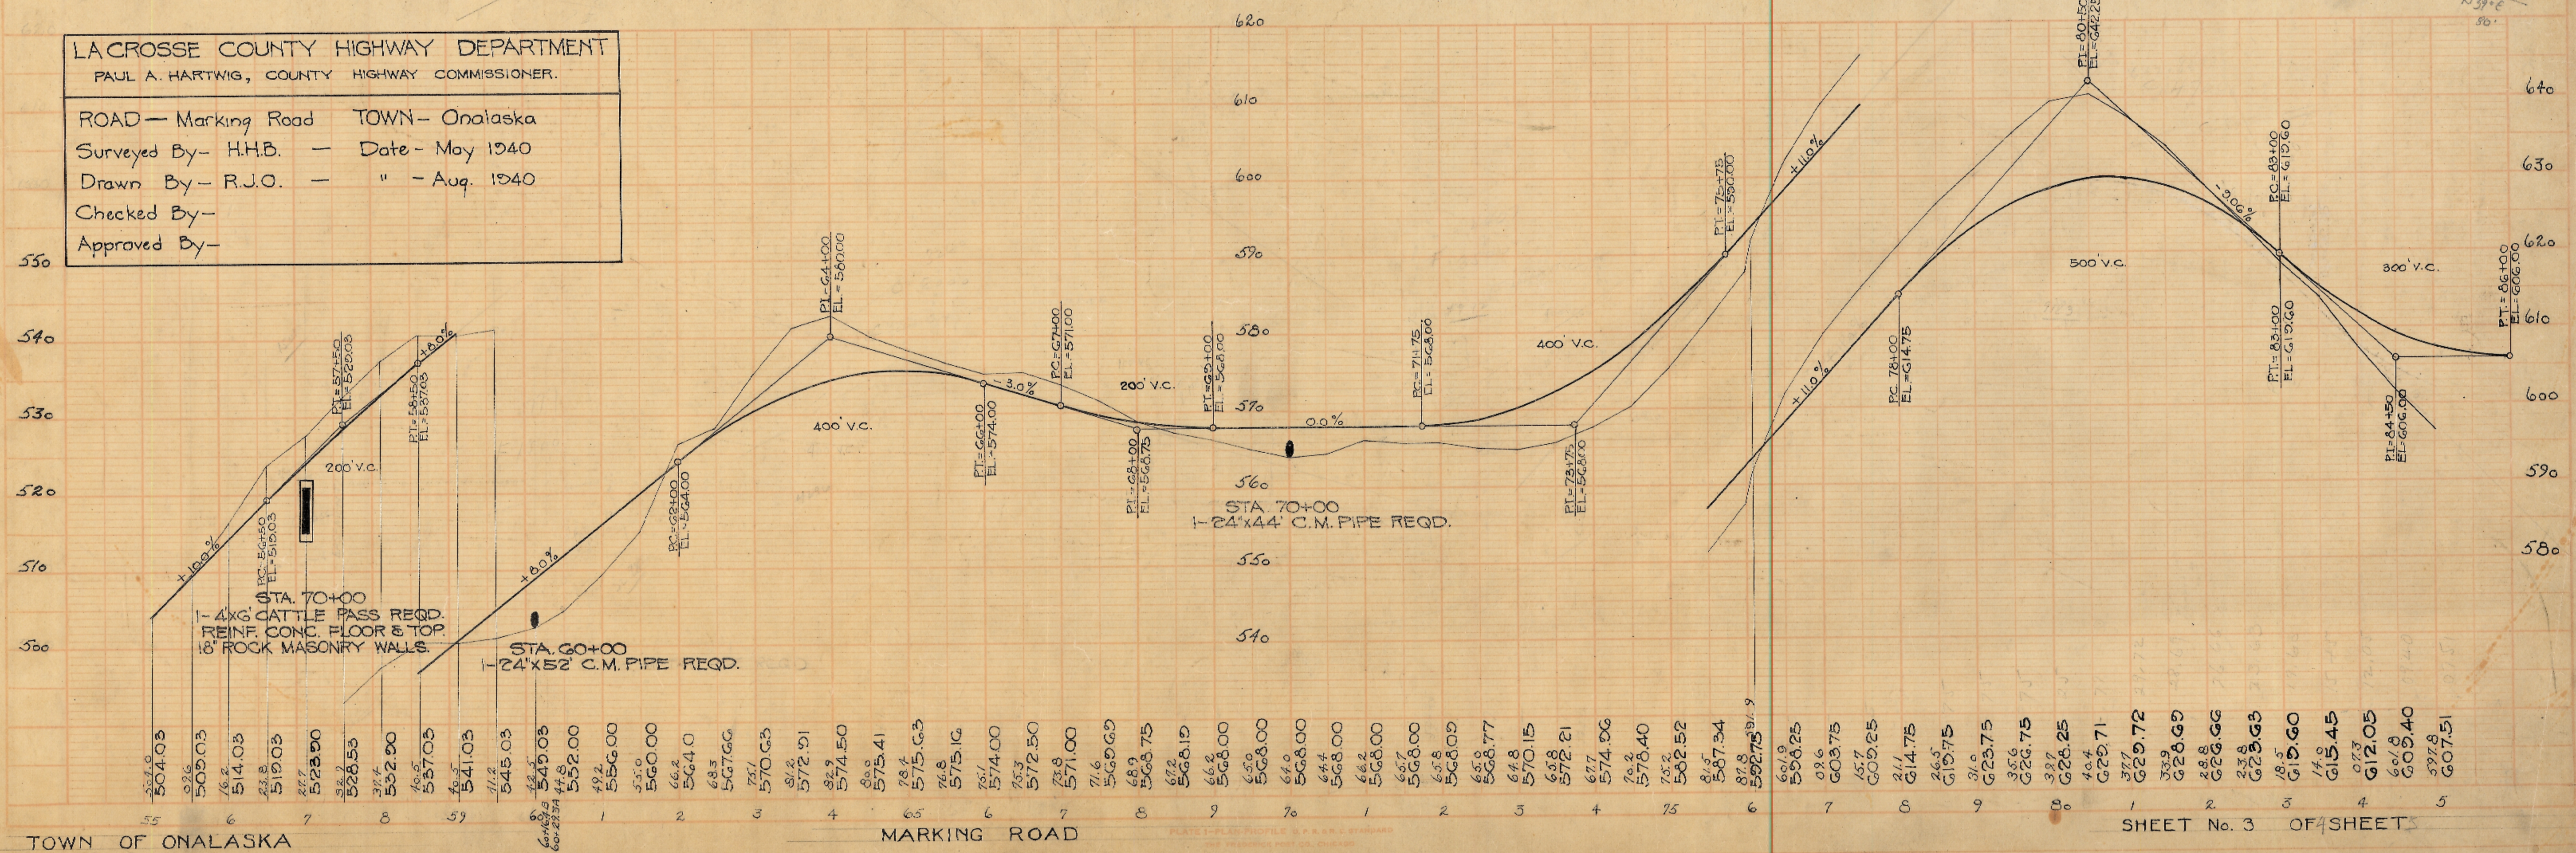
PLAN PROFILE (P. 5, 6, 8, STANDARD)
